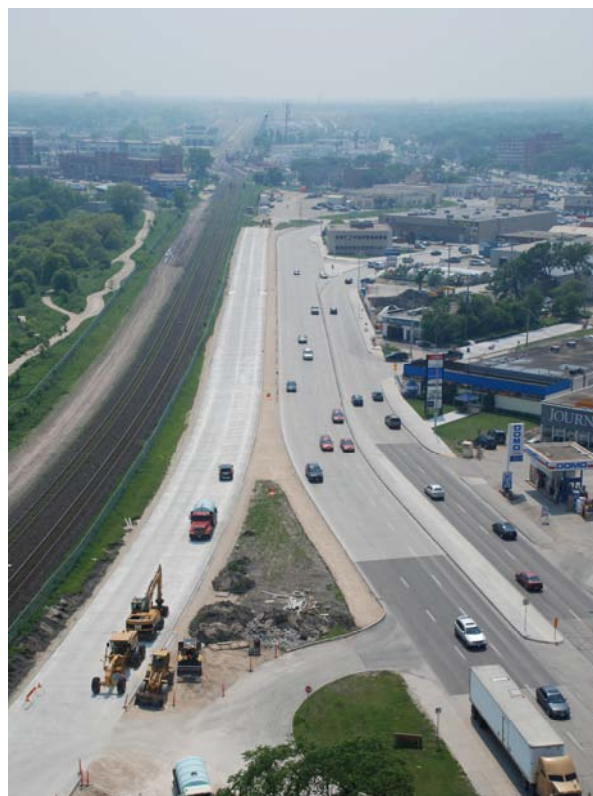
View of Corridor Parallel to Donald Street Looking South
